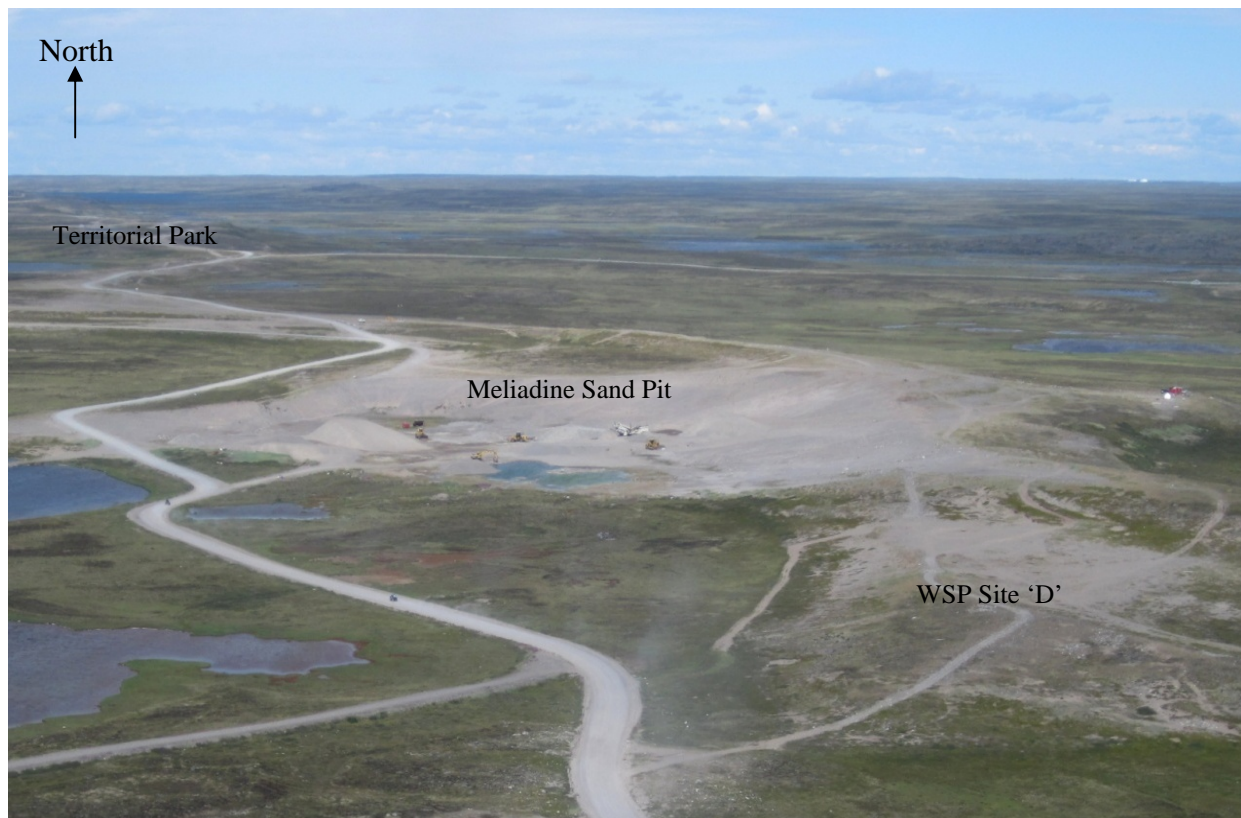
Aerial photo of the Meliadine Sand Pit and WSP Site ‘D’ (Photo: July, 2016).
